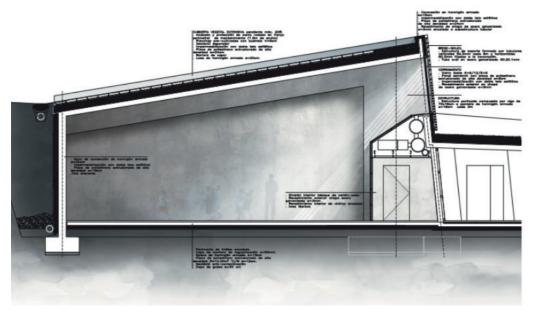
Detail Section through classroom, Sun School, RCR architects (2014) • Source: El Croquis
